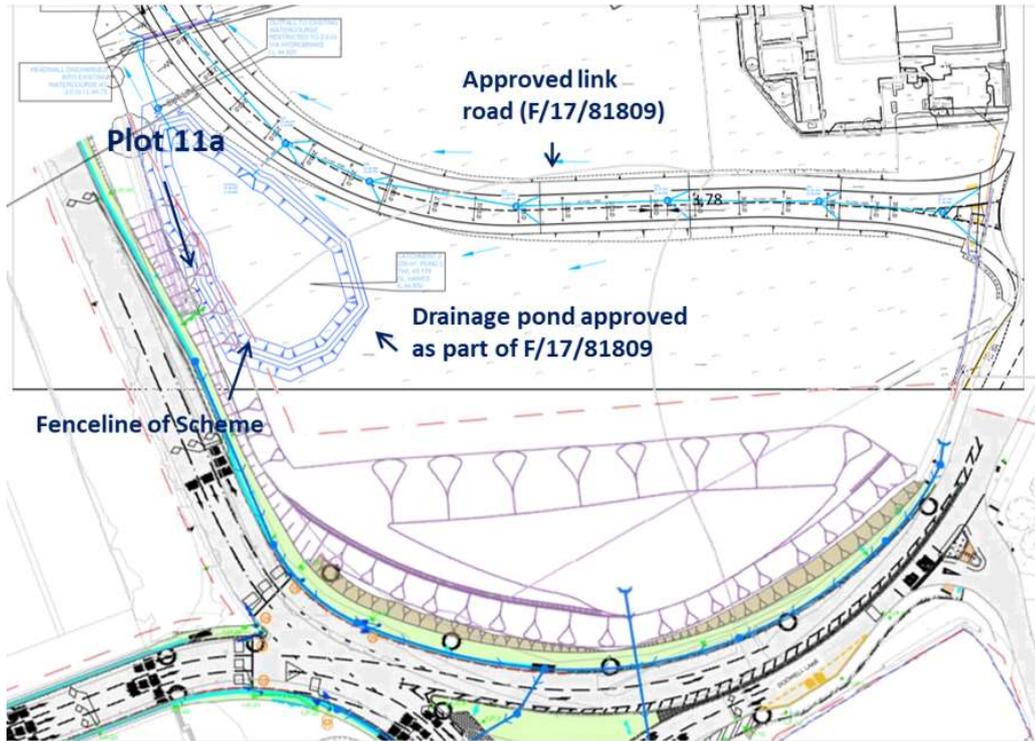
Scheme General Arrangement plan [CD.A.9] overlaid with approved plan 17053-2400 Rev P3 (drainage site layout) [CD.G.7], as part of F/17/81809.
